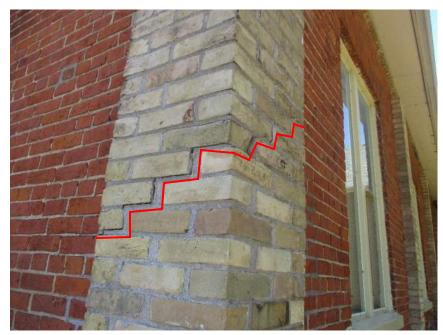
View of step crack in the northeast corner pilaster at the east elevation (original building).
